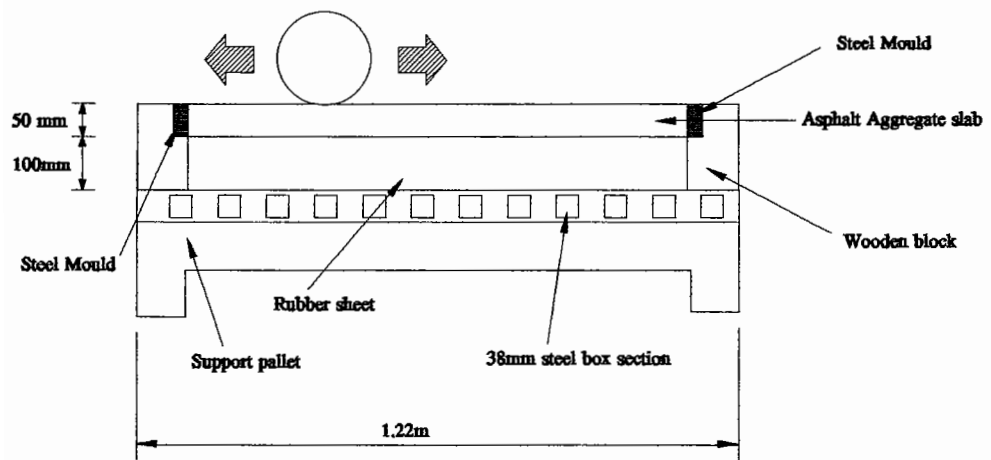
Slab Details for Fatigue Wheel Tracking Tests
